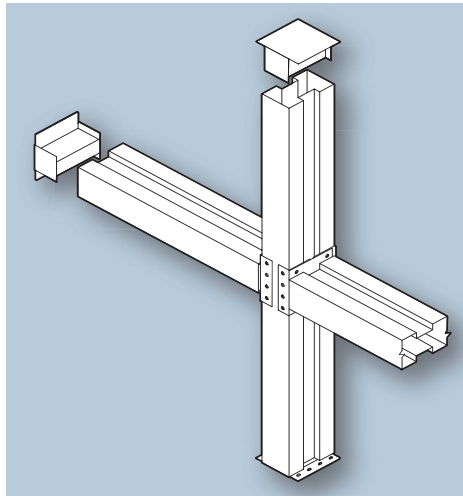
Detail B steel mullion for dividing oversized wall openings.
